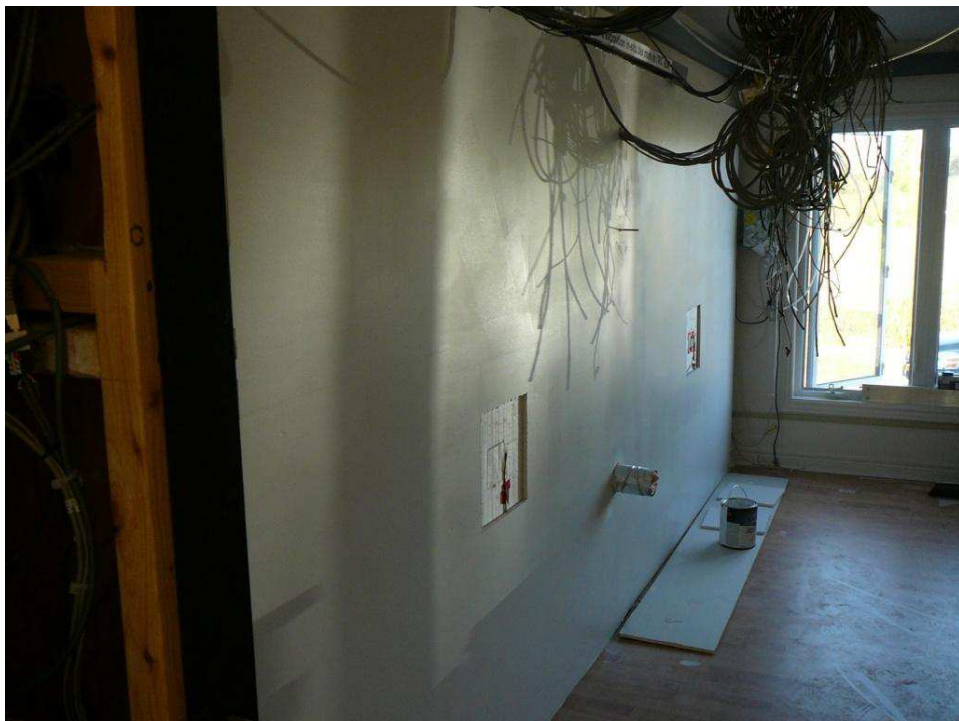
ICF walls painted with acrylic paint – with access panels open (the removed sections of drywall were set back into place and taped before the start of the experiment)
